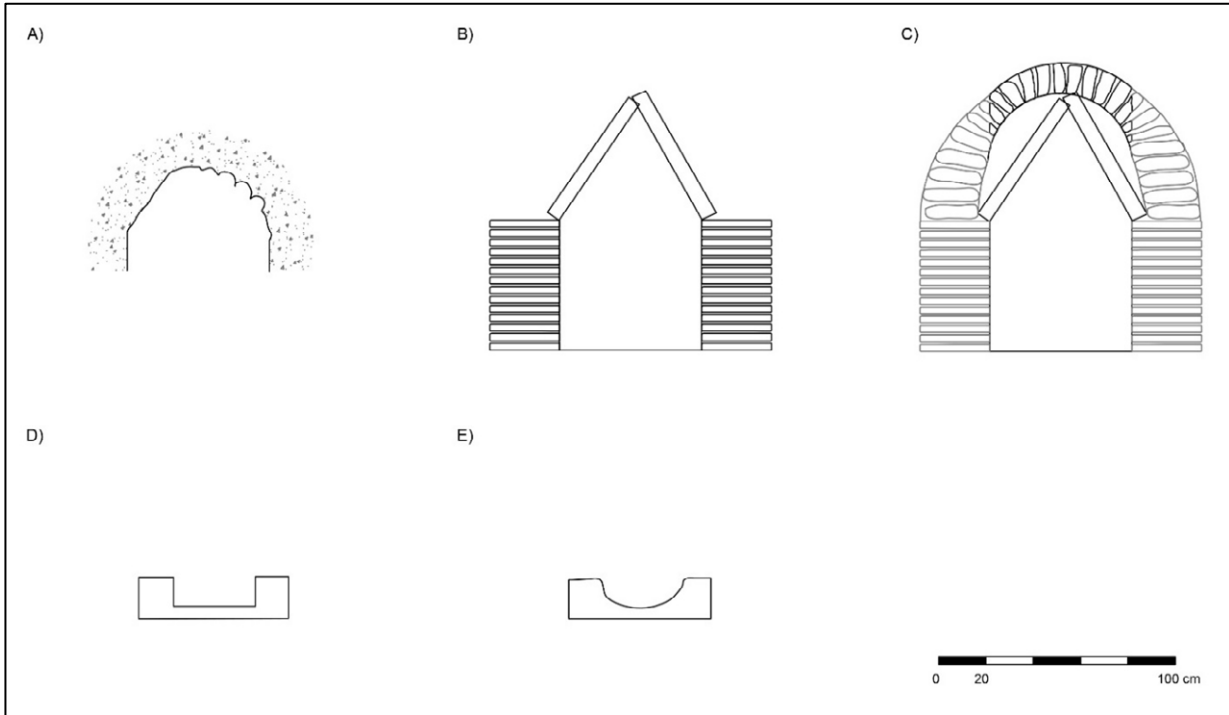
Reconstruction of the five section types of sewers and drains identified (illustrations were created by the author): A: vaulted roof sewer, B: gabled roof drains/sewer, C: rectangular cross-section open drain, D: rectangular section open drain, E: 'U' section open drain.
